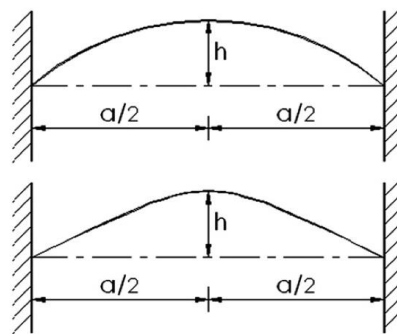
Circular and Parabolic arch plan view. (Zingoni et al., 2013).
